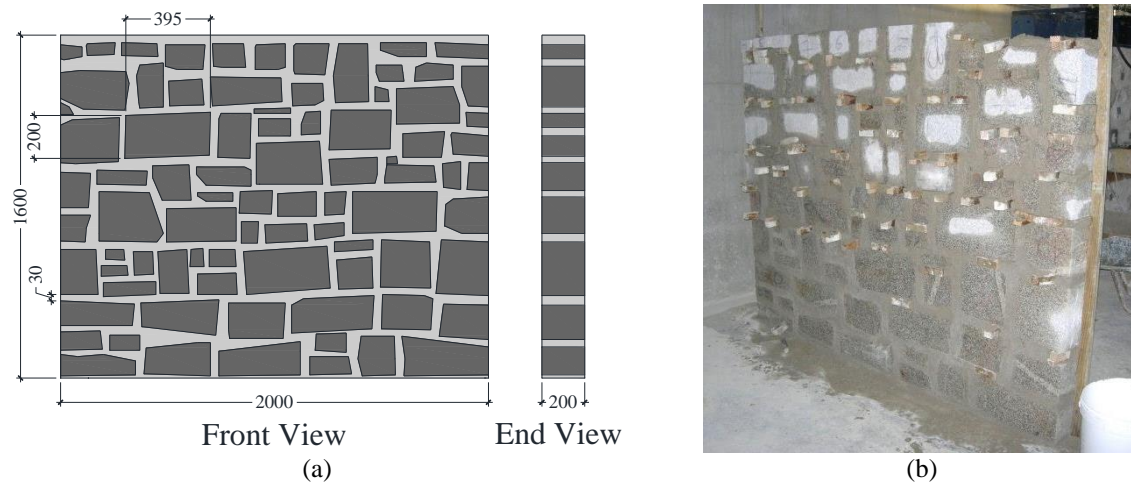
Semi-Irregular masonry wall: (a) schematic design (dimensions in mm); and (b) construction
